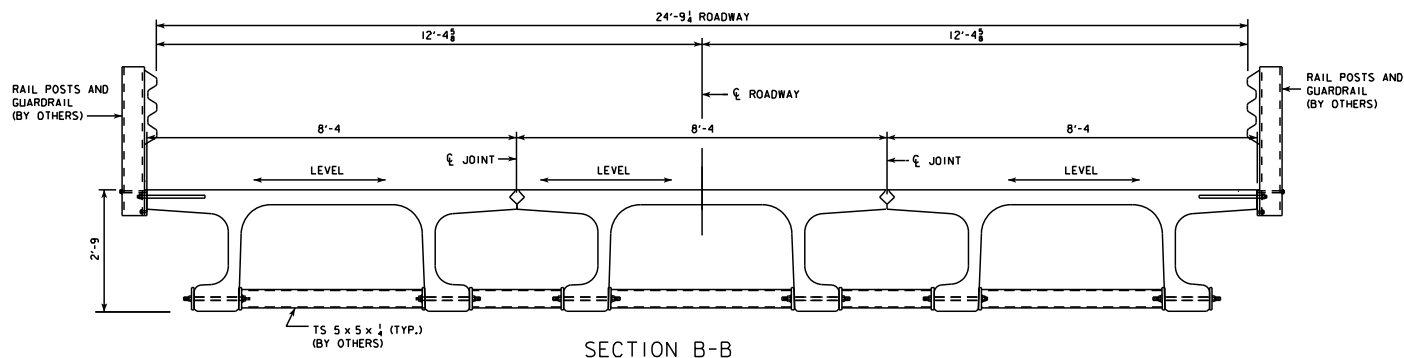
Proposed bridge cross section of Buchanan County Bridge
